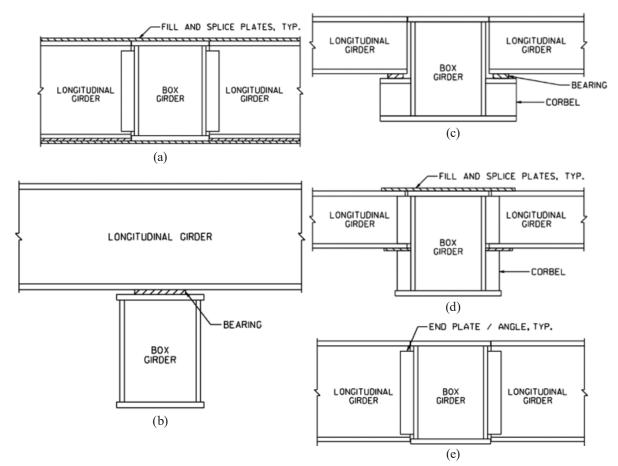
Longitudinal girder framing options for an (a) integral system, (b) stacked system, (c) corbel beam framing with longitudinal beams on bearings, (d) corbel beam framing with integral connection, and (e) end plate/end angle framing (not recommended)
